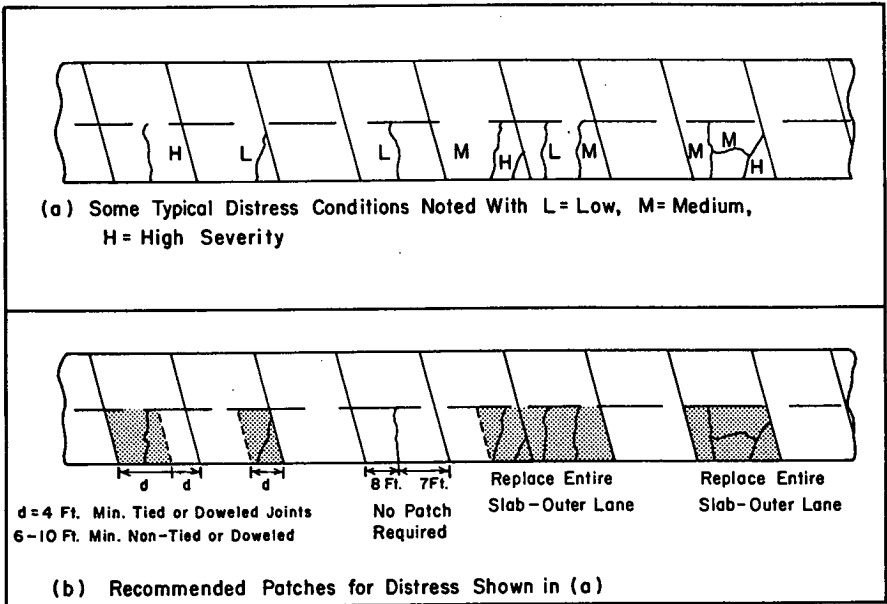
Recommended designs for partial and full lane width patches for plain jointed concrete pavements (see Fig. I-3 for load transfer).
